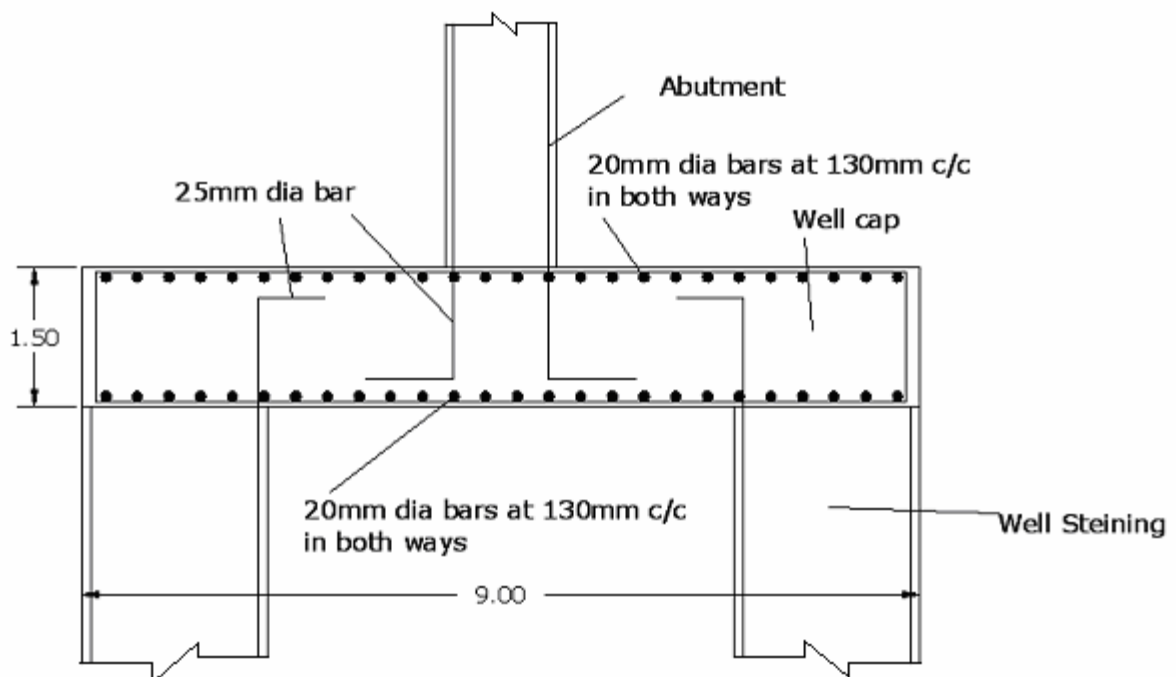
REINFORCEMENT DETAILS OF WELL CAP
